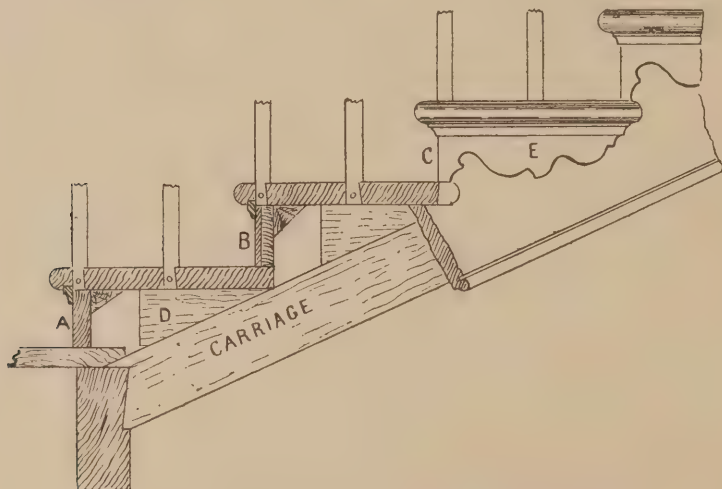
DETAILS OF CUT AND BRACKETED STAIR.
